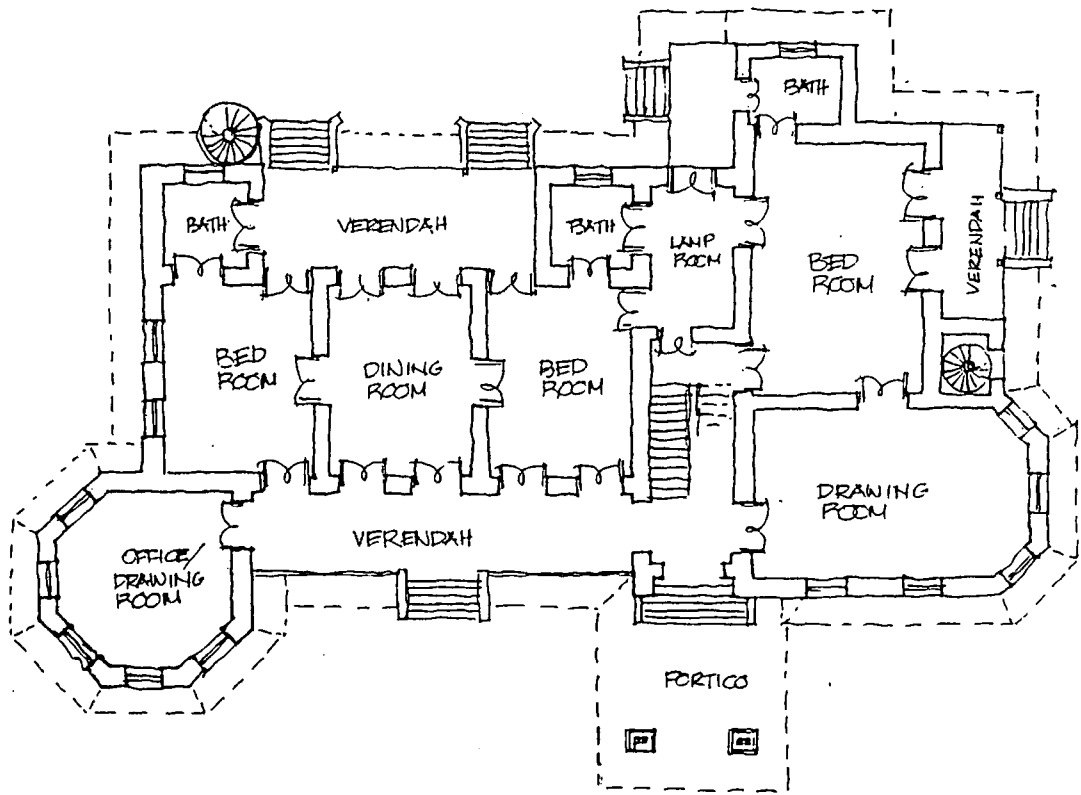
Ground floor plan, Chummary, Dhaka
